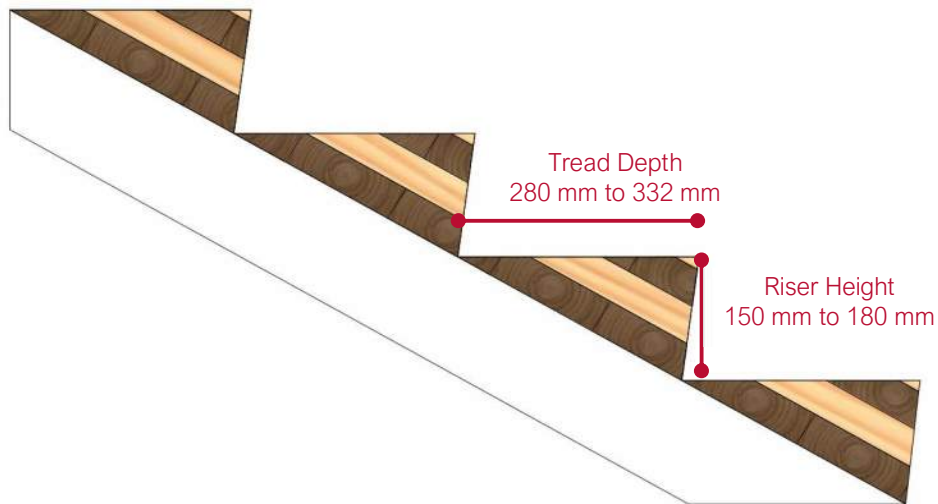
Pitch line, tread, and riser dimensions for common and main private stair ways.
